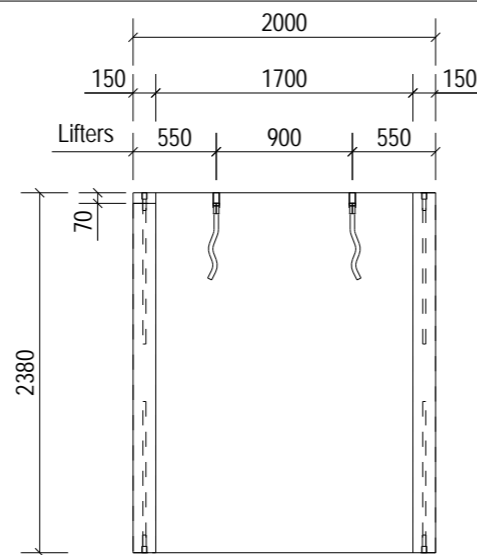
BYL-1462-LW-0002-RC1 Rev: C01
